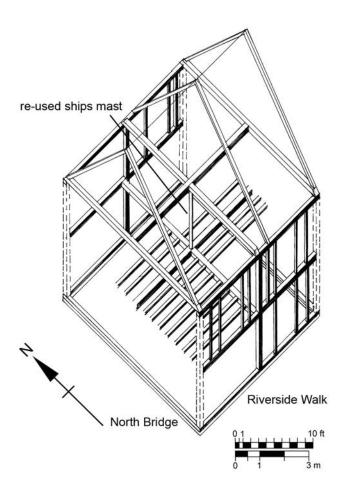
Riverside Cottages, North Station Road (corpus no. 78). 1 Riverside Walk is on the far left, closest to North Bridge
